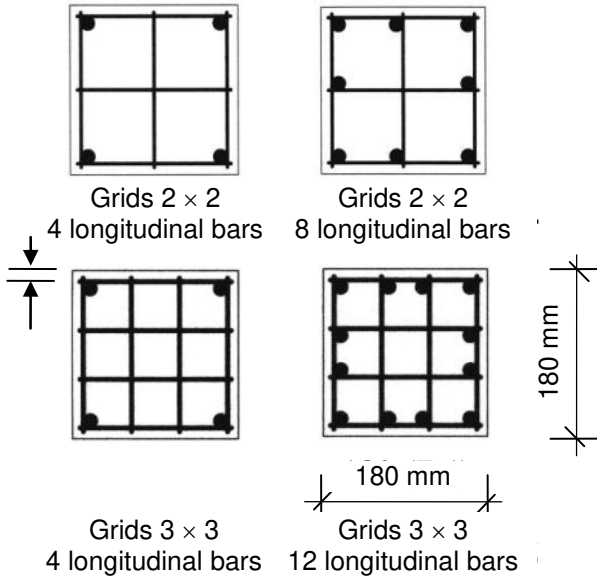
Cross sections of specimens tested by Tavio et al. [33]
